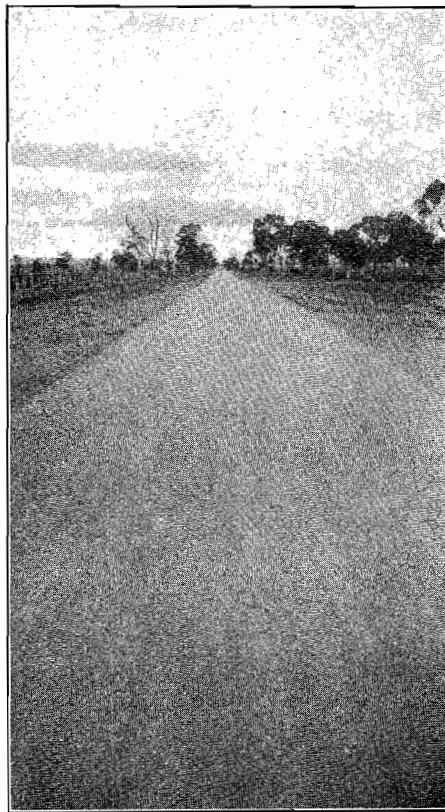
Reconstructed Portion (Asphaltic Macadam).
